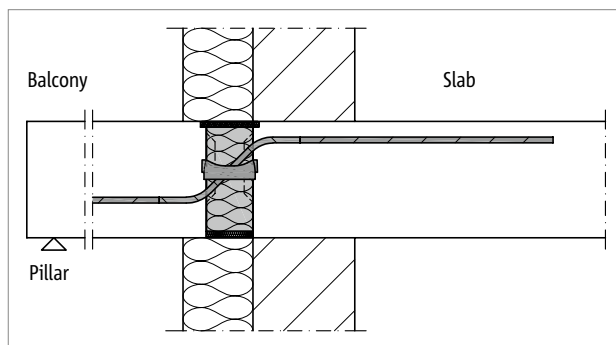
Schöck Isokorb® T type Q-E: Connection for exterior insulation
